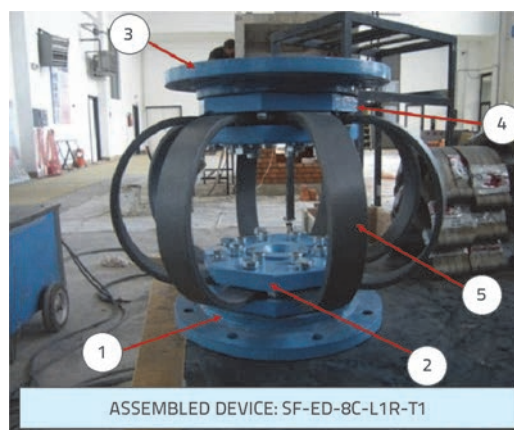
Assembled basic device SF-ED-8C-L1R-T1: (1) lower base plate; (2) lower support plates; (3) upper base plate; (4) upper support plates; (5) SF-ED component
